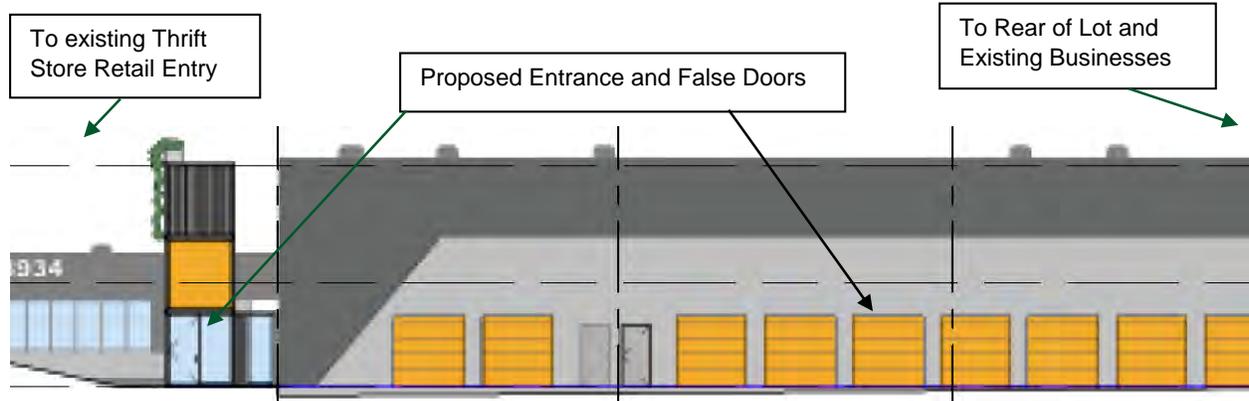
Section of North Elevation Adjacent to Quadra Street Entrance (Provided by CEI Architecture)
